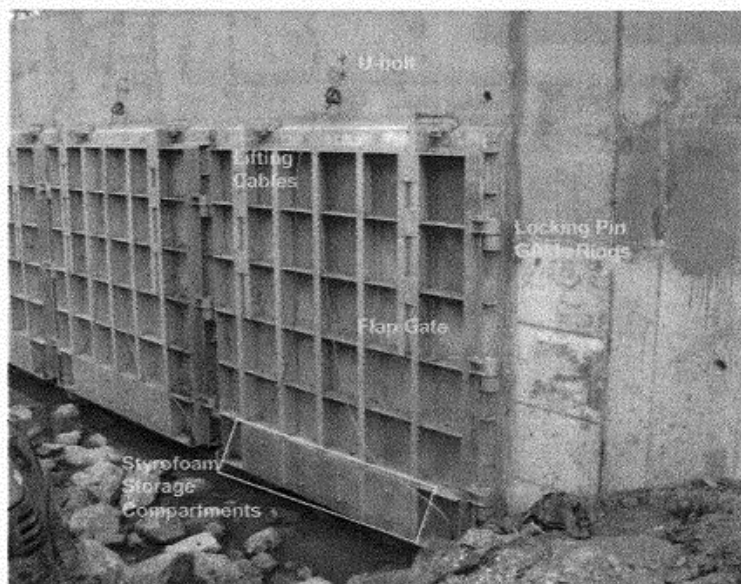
CS-29 Black Bayou Culverts - West Side – Dewatered
